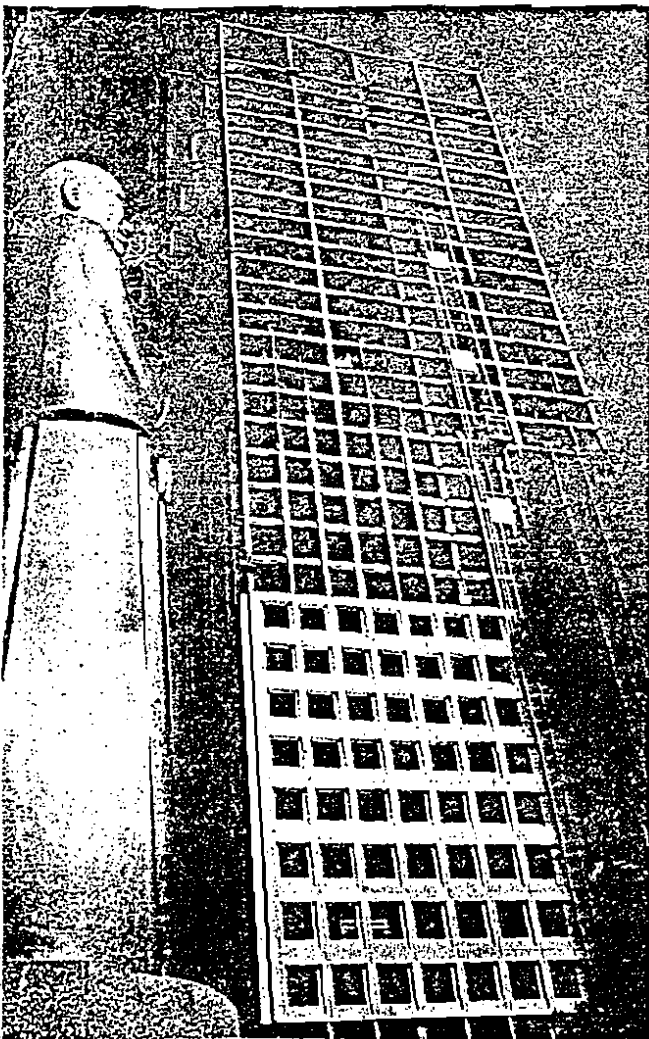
Welded connections contributed to safer and more economical erection of the stately 33-story Hartford Building in San Francisco, California's tallest skyscraper. Semi-automatic welding, using self-shielding cored electrode, speeded completion of 80 beam-to-column connections per floor.
